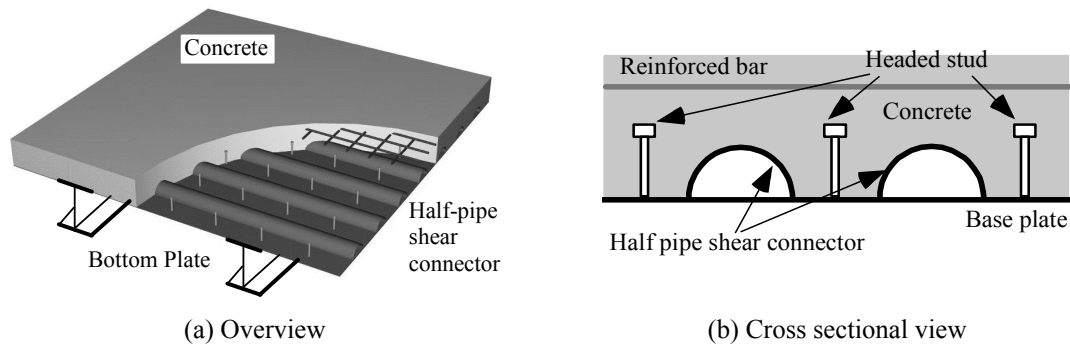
Steel-concrete composite deck welded half-pipe shear connectors (H-SCCD)
